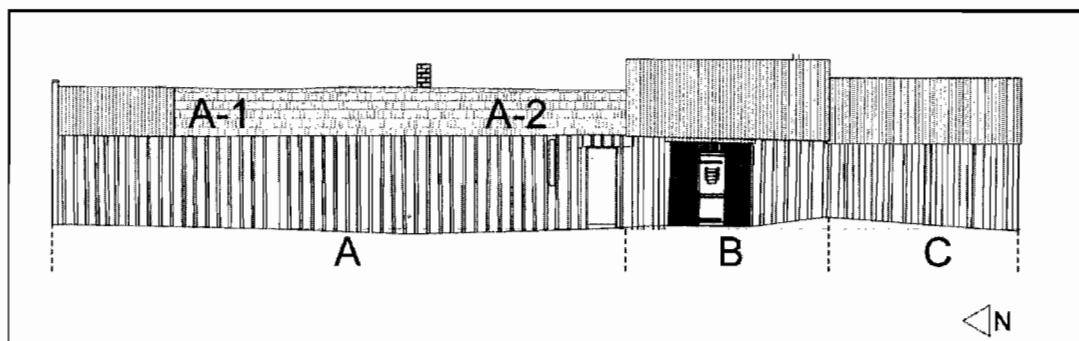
The Jeff. Smith's Parlor Museum west elevation with section labels.
